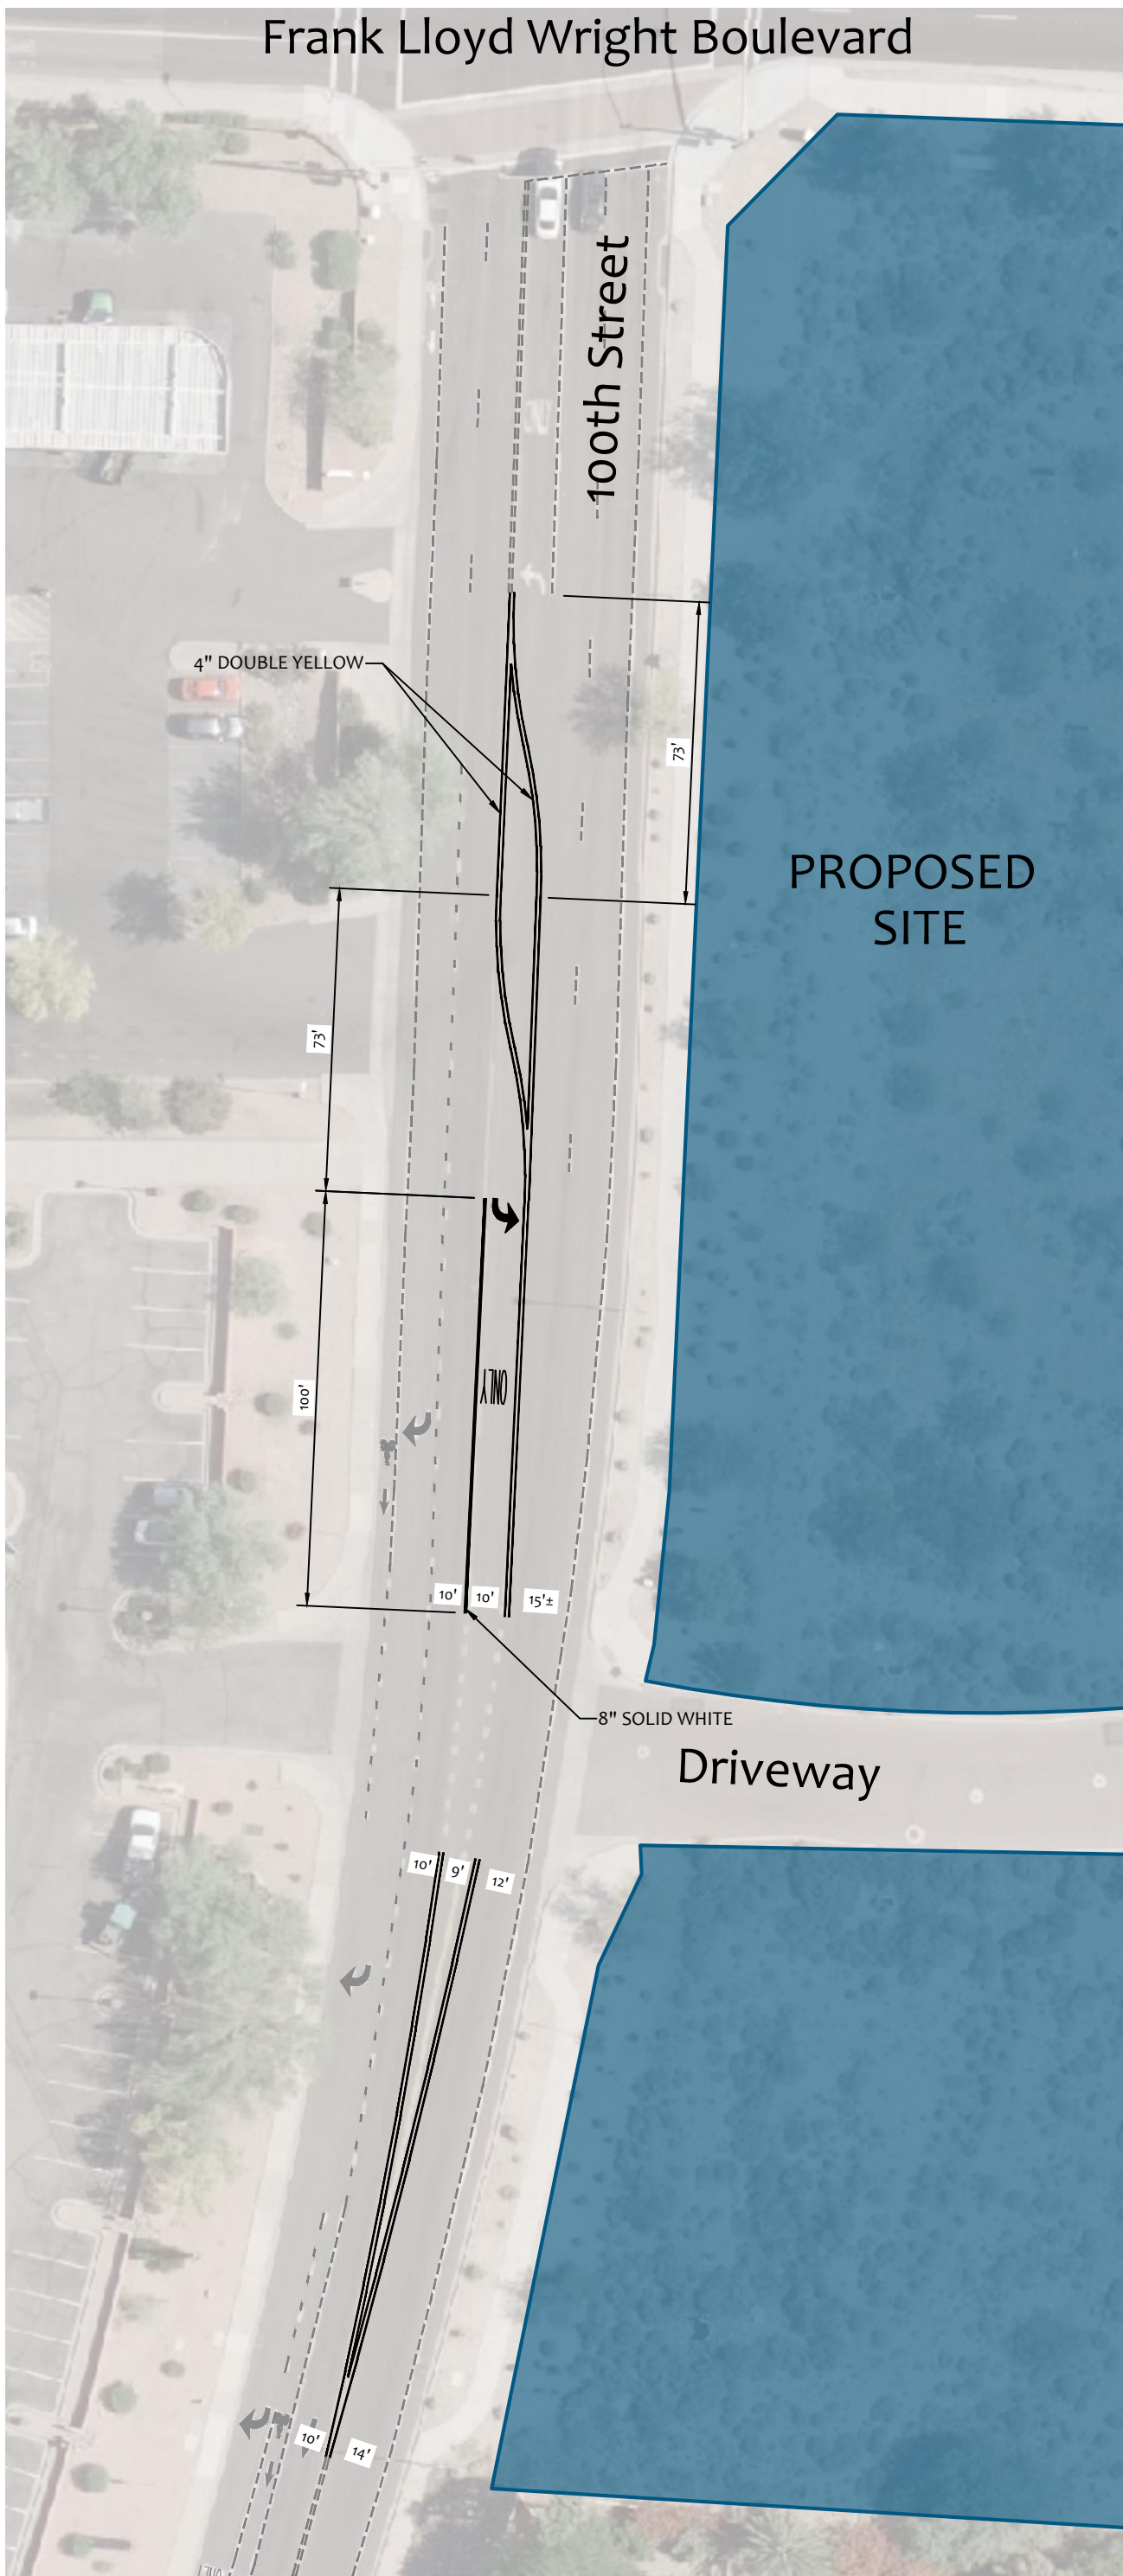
| 100TH STREET PAVEMENT MARKING MODIFICATION 16-ZN-2022
